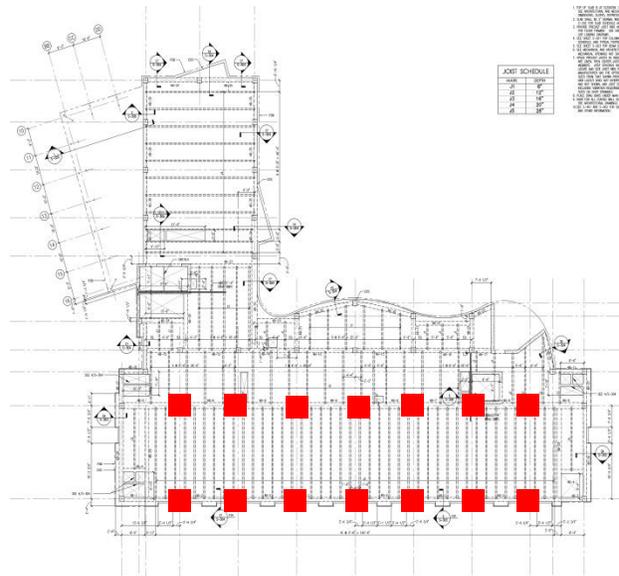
Floor plan showing the 6,000 psi column in basement and 1 floor
